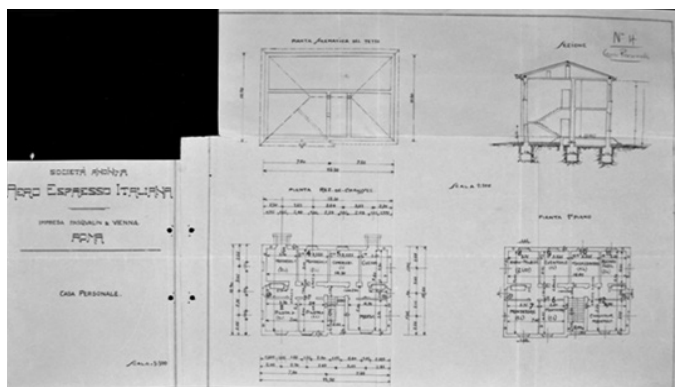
Building of AEI officer and servant, plan, section and roof drawings (BCA 2).
